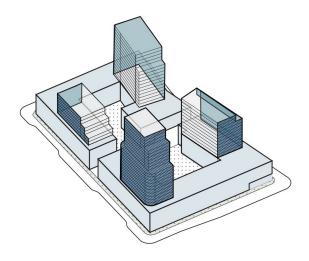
Dwelling Units at Grade in Mid-Rise Elements, Facing the Street
